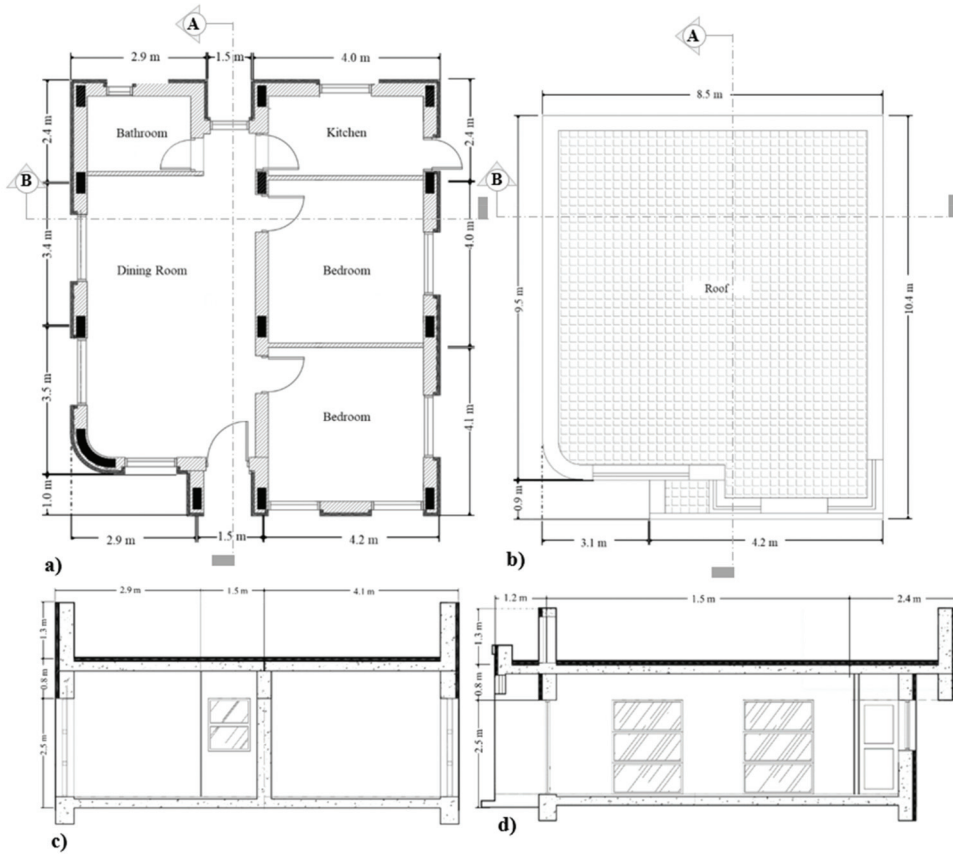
The technical drawings for (a) ground floor, (b) Site plan, (c) section A, and (d) section B.
